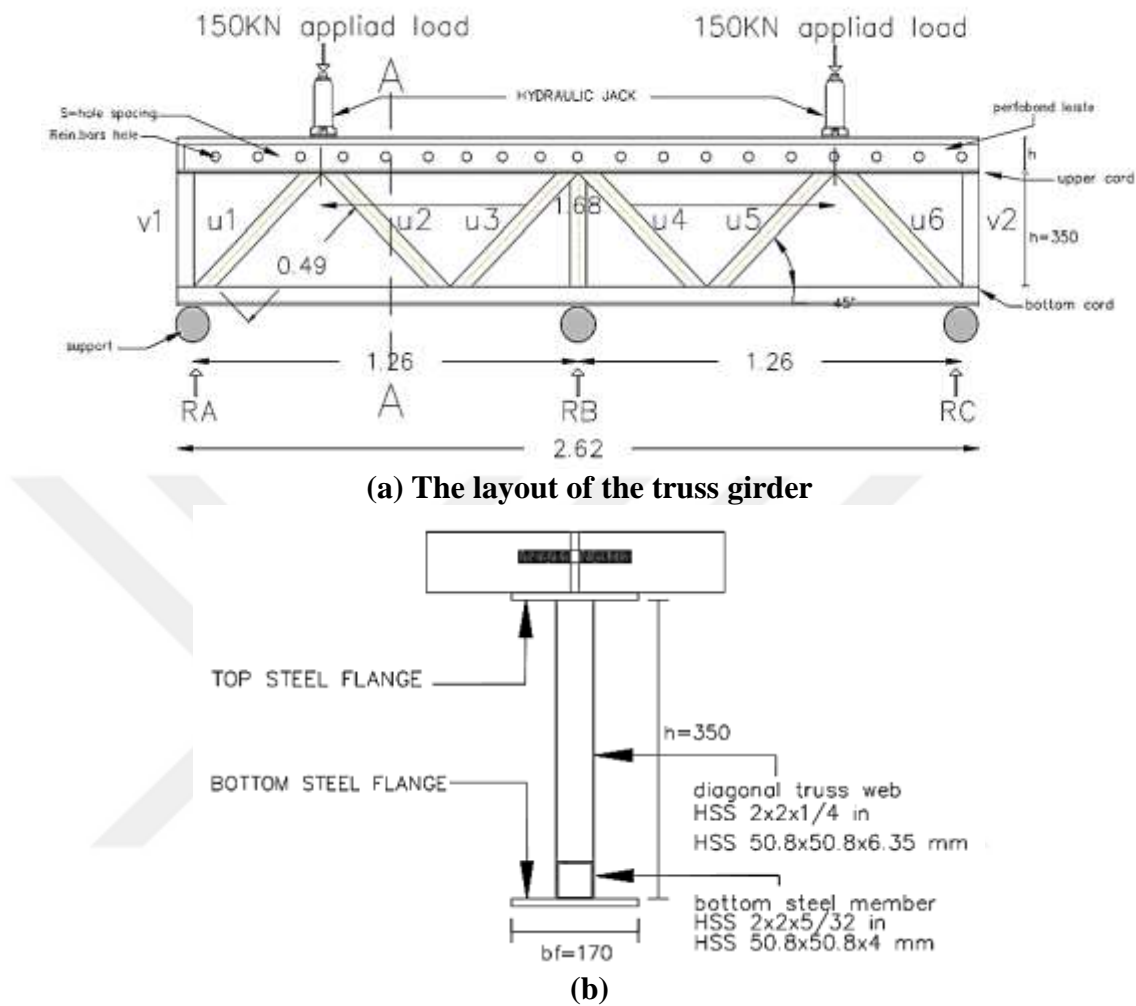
Specimens' Dimensions and Loading Situation (a) the Layout of the Truss Girder (b) Section A-A
